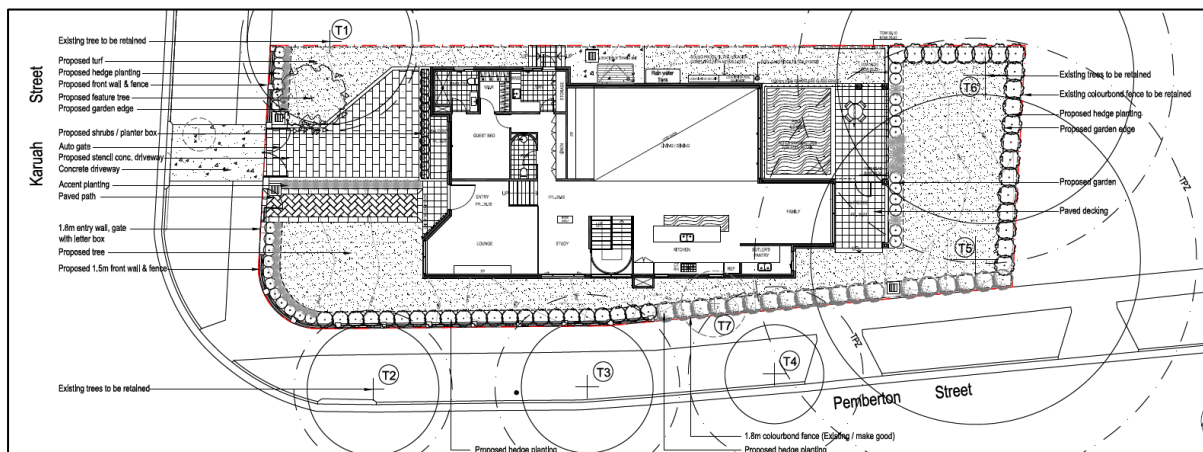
Proposed Landscape Plan (originally submitted driveway design)
